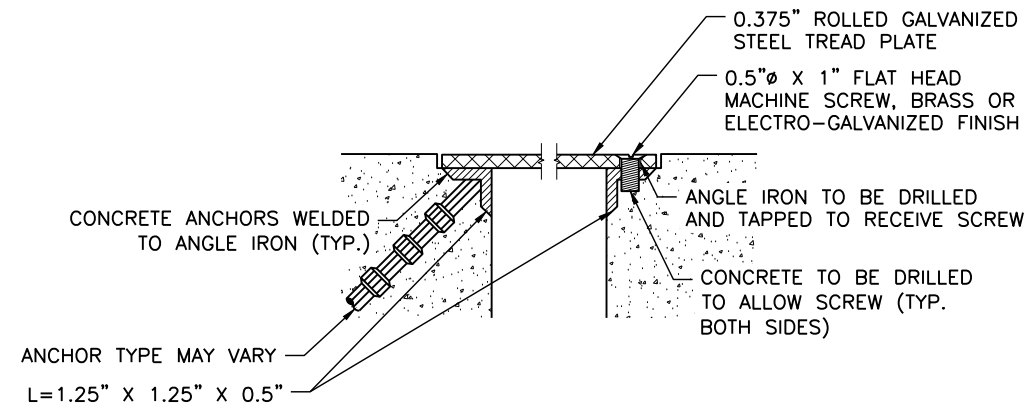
DETAIL EE - SIDEWALK CHASE DRAIN
